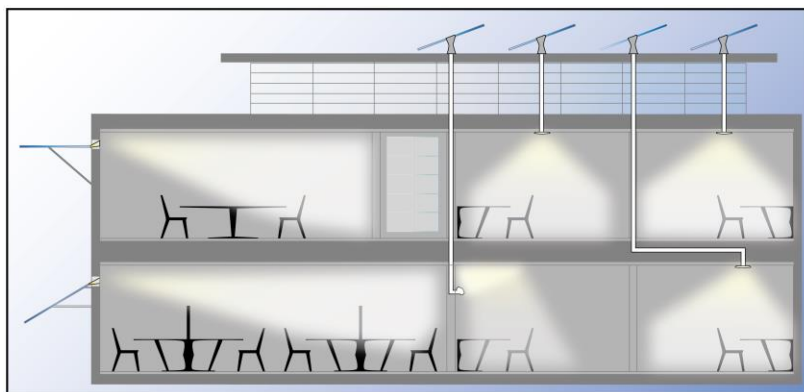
Diagram of rooftop concentrator and façade-mounted panels providing daylight to building interior.
